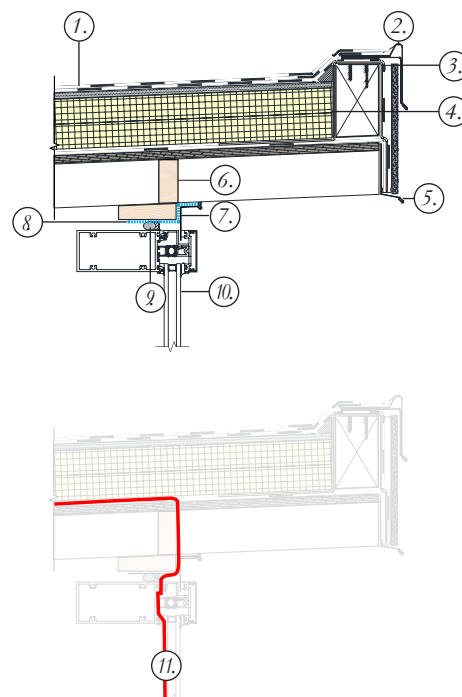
Example Horizontal NLT Roof Assembly to Soffit Transition Detail at Window Head
